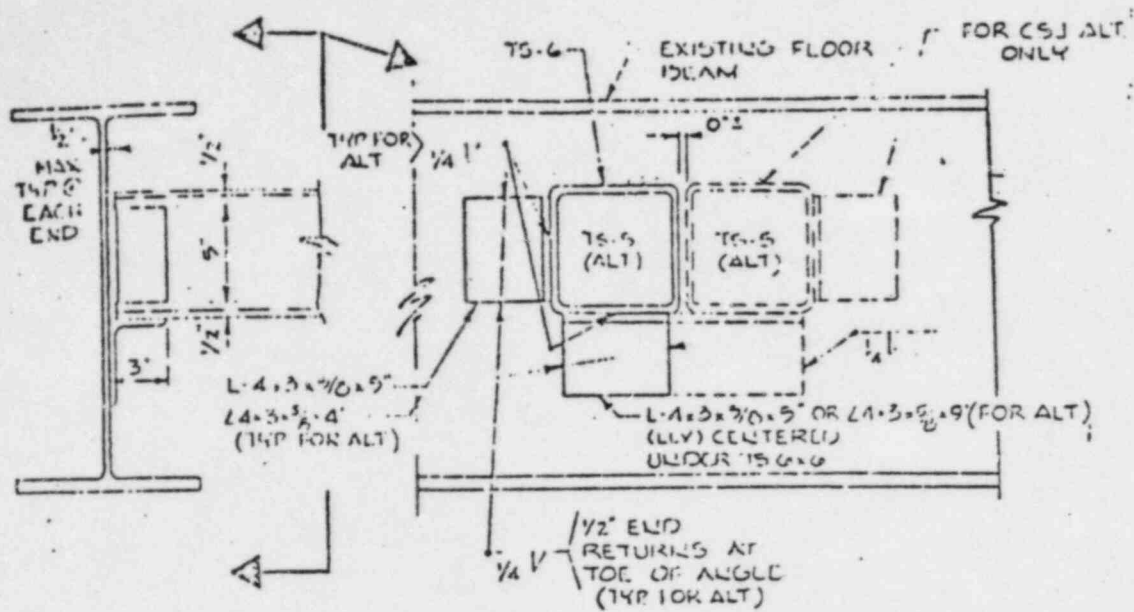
TYPICAL CROSS OVER BEAM CONNECTION
